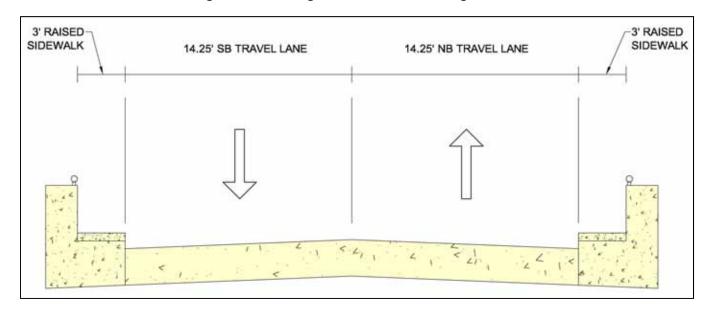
C: Existing Rowlett Park Drive Bridge Cross Section
